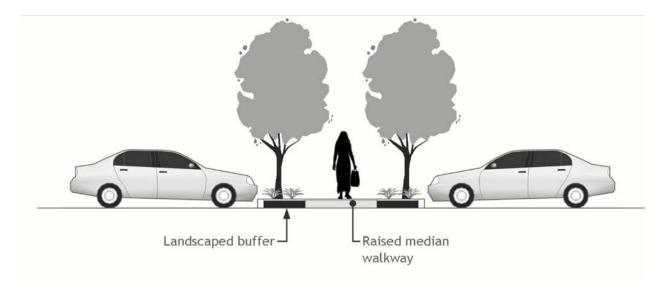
C: Pedestrian Walkways in Parking Lots
